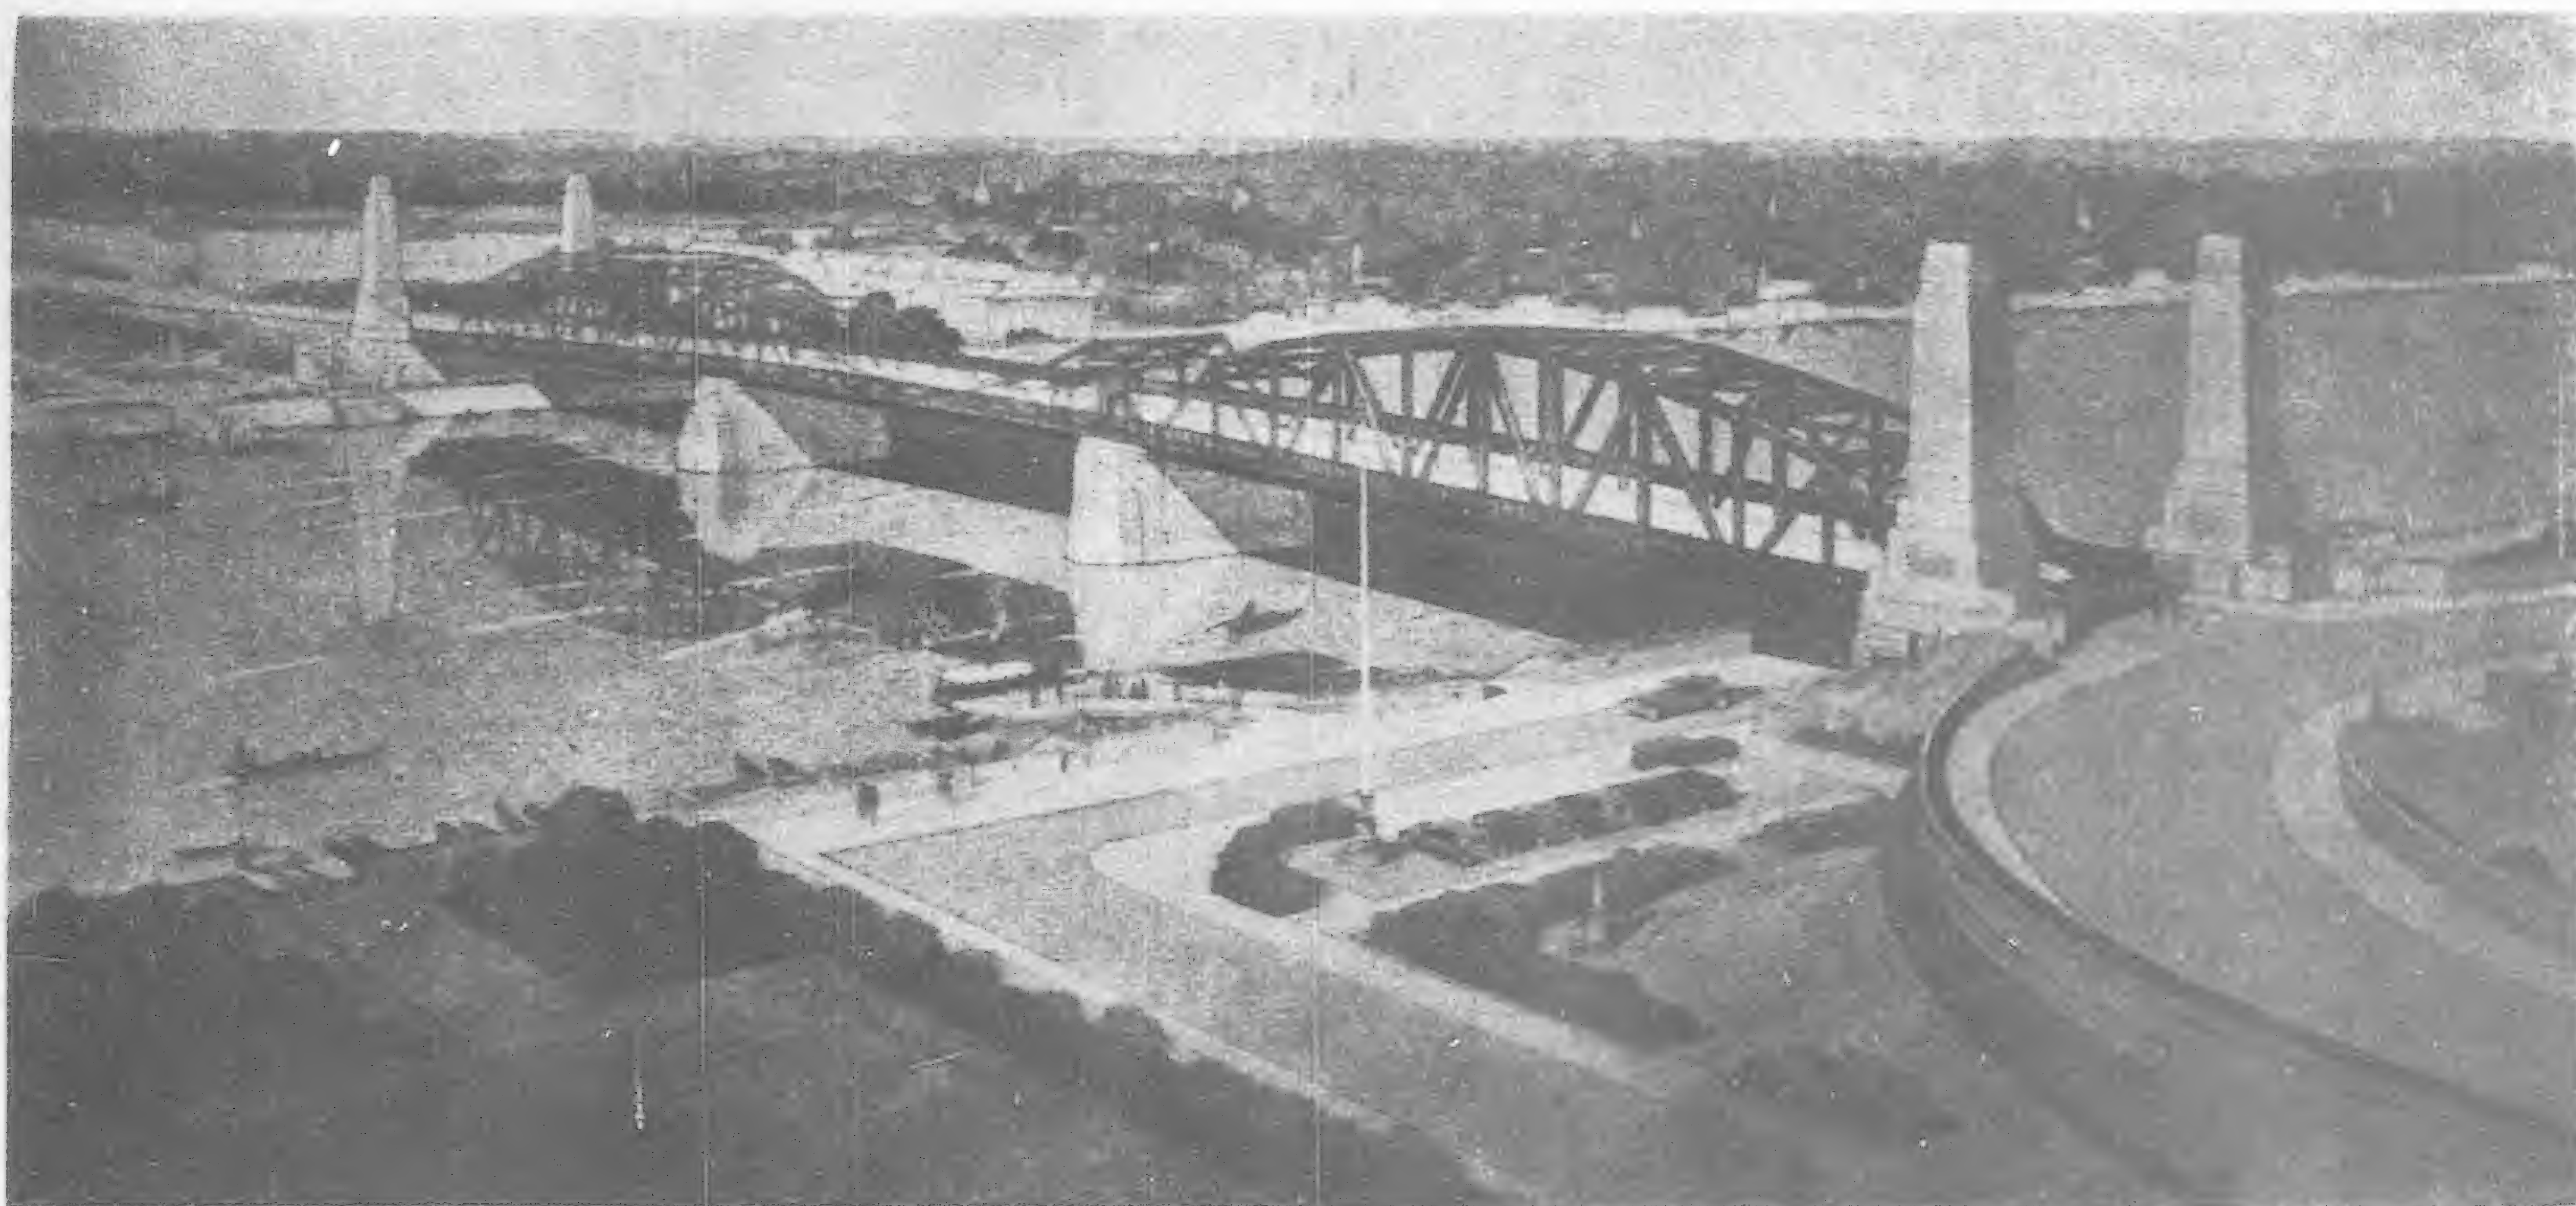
Architect's Proposed Lay-Out of Bridge
